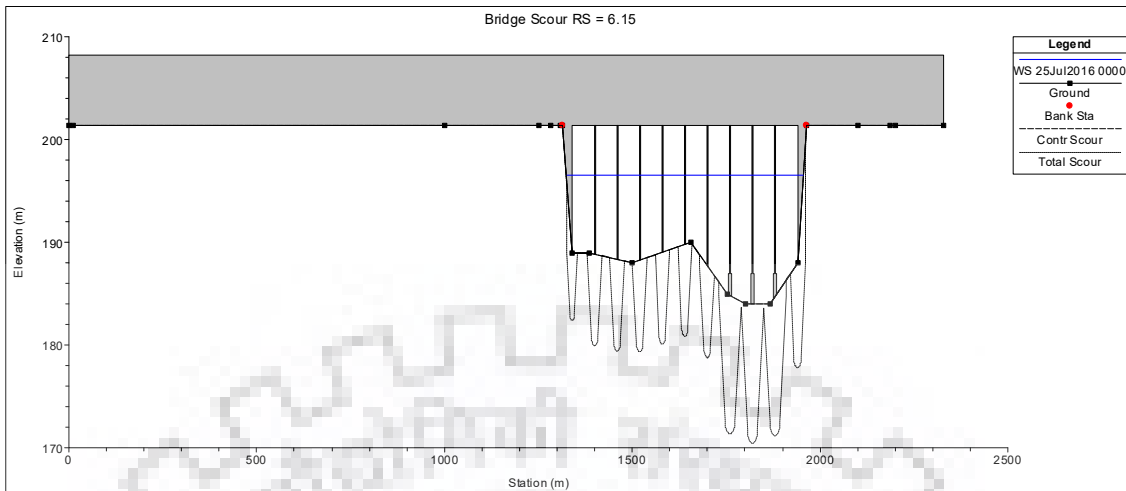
Scour around bridge abutment and piers at 14500 cumec for Bridge 2
